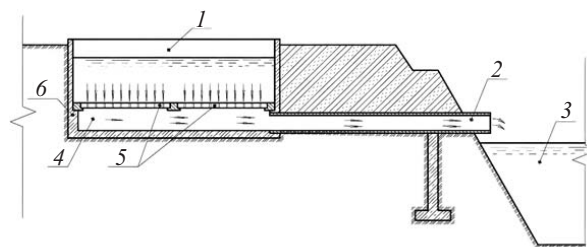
Scheme of a water intake structure from a mountain watercourse [5]: 1 — water collector of intake structure; 2 — tubular drains; 3 — water intake basin of irrigation system; 4 — catch gallery; 5 — filter panels of water intake; 6 — abutments
